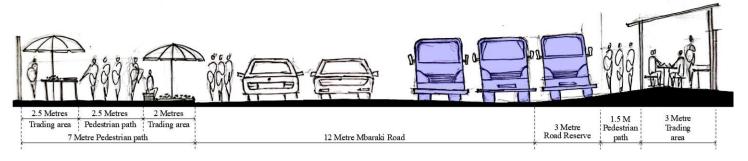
Section 1, section across Mbaraki road. Source Author 2022
